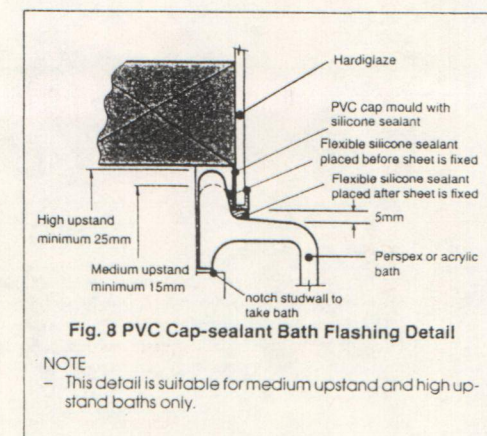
PVC Cap-sealant Bath Flashing Detail
